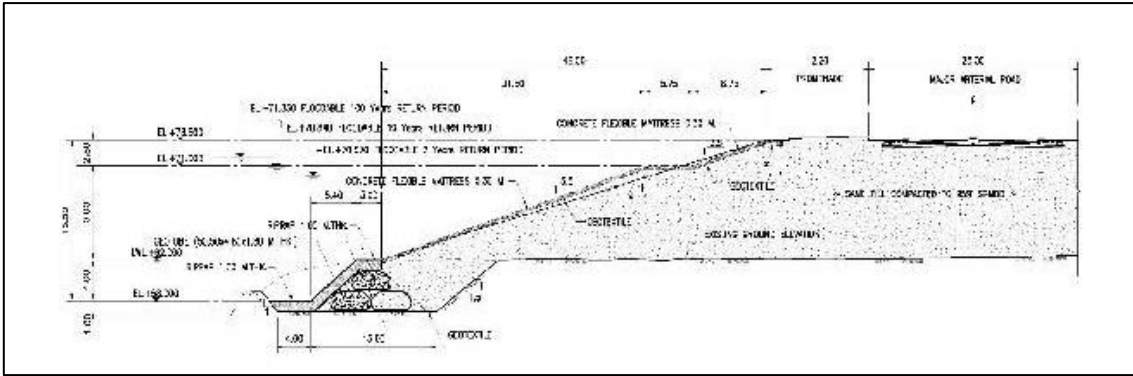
Section of Waterfront (riprap geotube + concrete flexible mattress) Alternative 7
